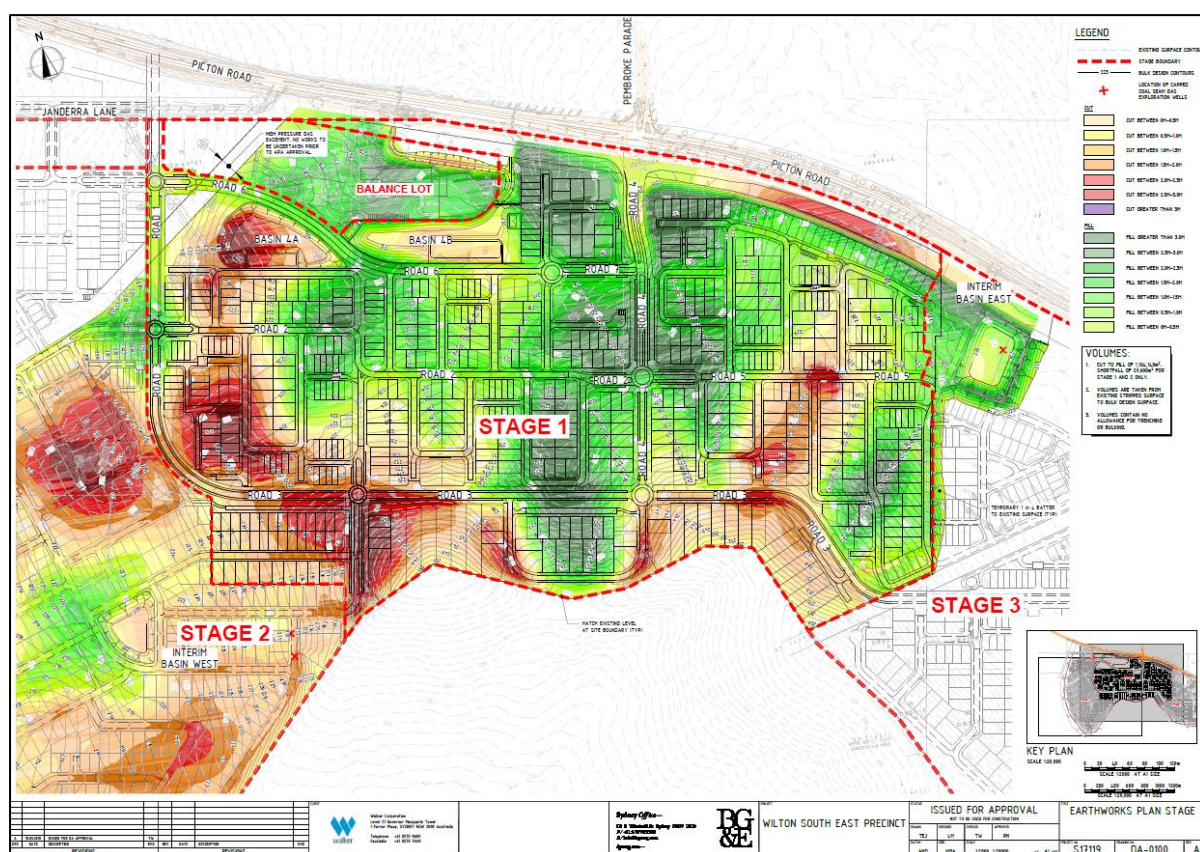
Proposed Stage 1, part Stage 3 earthworks.
